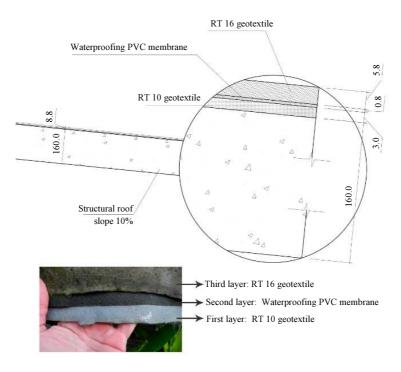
Detailed roof cross section of a three layered tropical greenroof technique. Cross section of roof covered by the three layers that are responsible for waterproofing and rooting media (all dimensions in mm) and picture of the three layers
